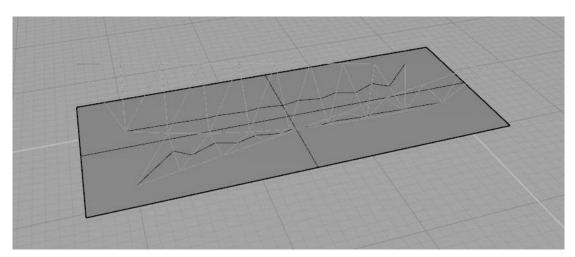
Perspective view of the main truss and deck intersection from 22
